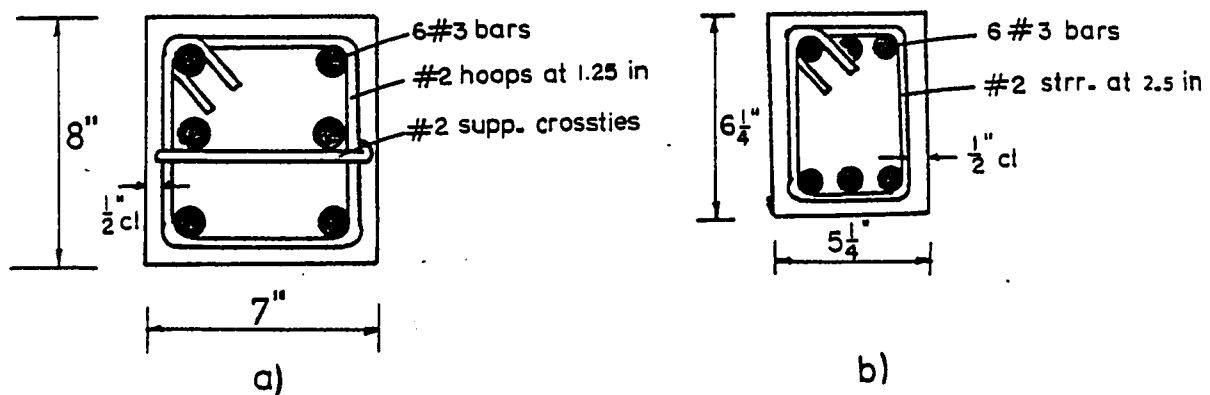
CROSS SECTION AND REINFORCEMENT DETAILS FOR a) COLUMN;
